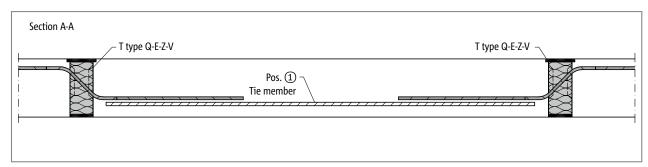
Schöck Isokorb® T type Q-E-Z-V: Tie member connection
